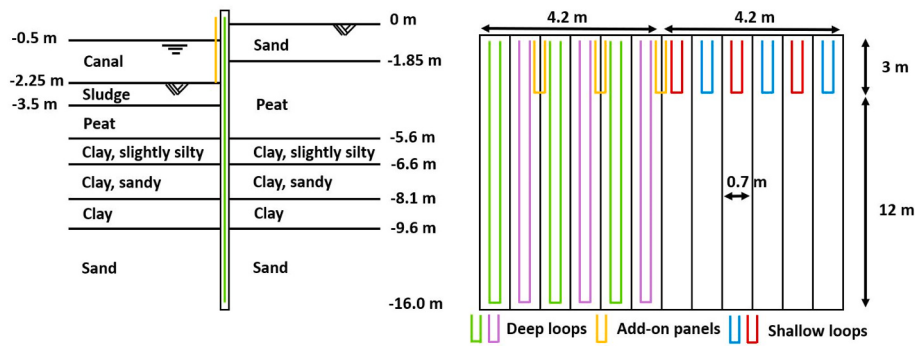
Energy quay wall full scale test: soil layers and heat exchanger pipes layout.
